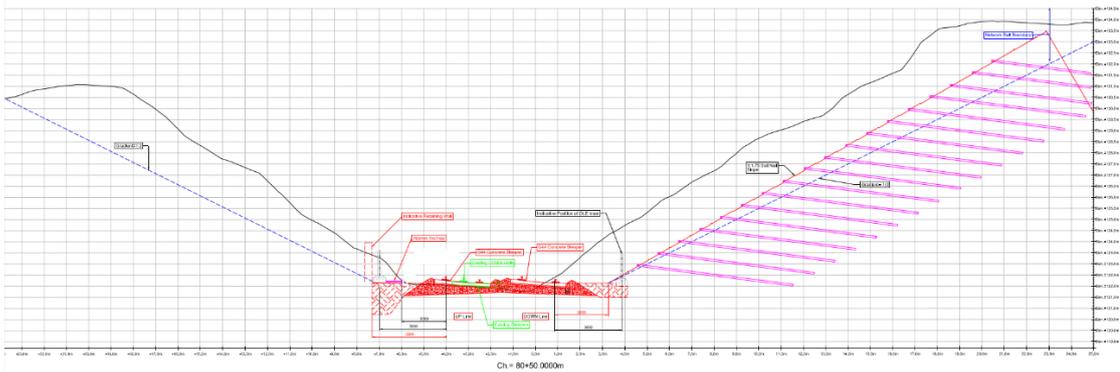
Proposed Earthworks Cross Section at chainage 8050m
